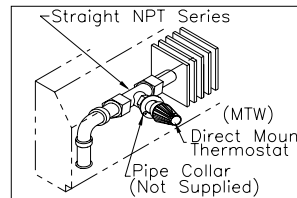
Typical Installation of Direct Mount Thermostatic Head in Baseboard
